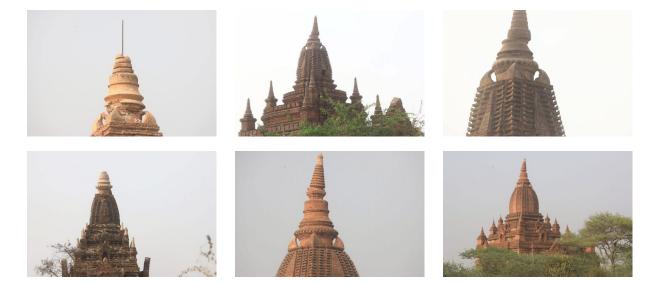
Examples of damage to the roof structures of the temples of the Bagan Ancient Cultural Heritage Zone (World Heritage Site) (Source: Mizzima-Burma).
